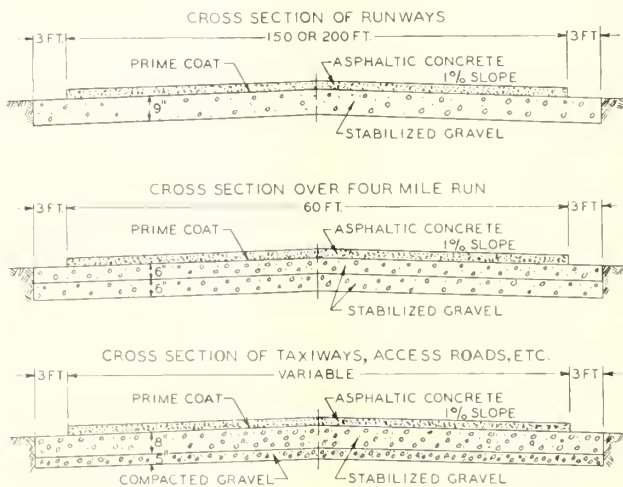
TYPICAL PAVING CROSS SECTIONS, WASHINGTON NATIONAL AIRPORT.
